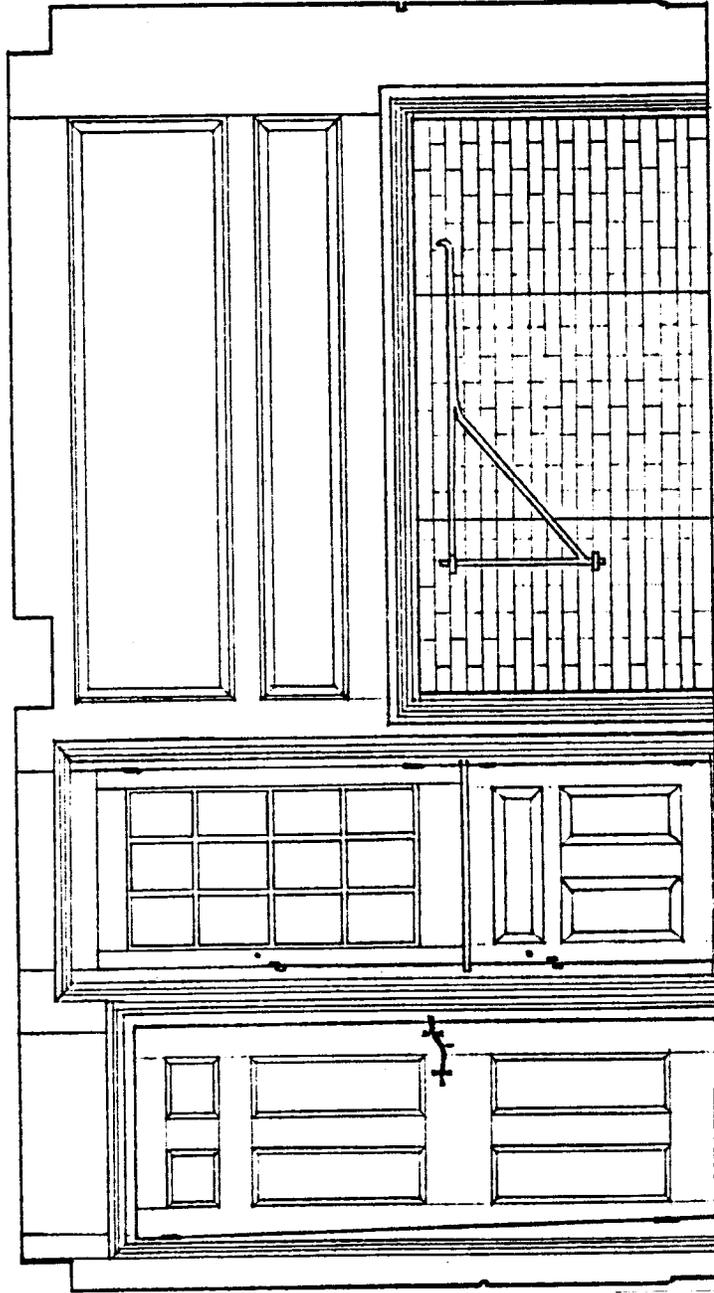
Atwood-Higgins House: East Front Room, West Wall.
